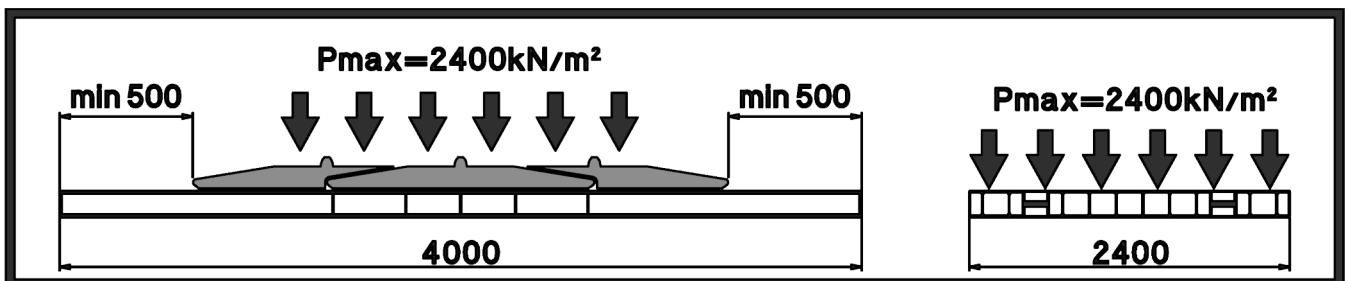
Driving the outrigger pad in the cross direction with a crawler crane
